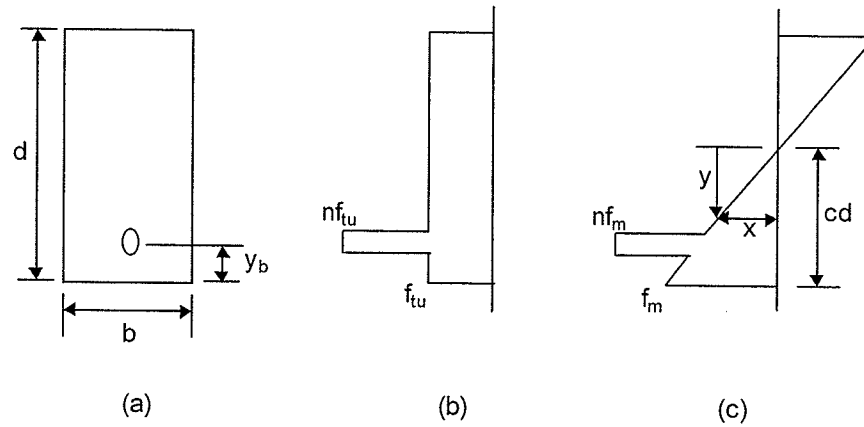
a) Cross-section b) Axial Tension Stress Distribution of Reinforced Section
